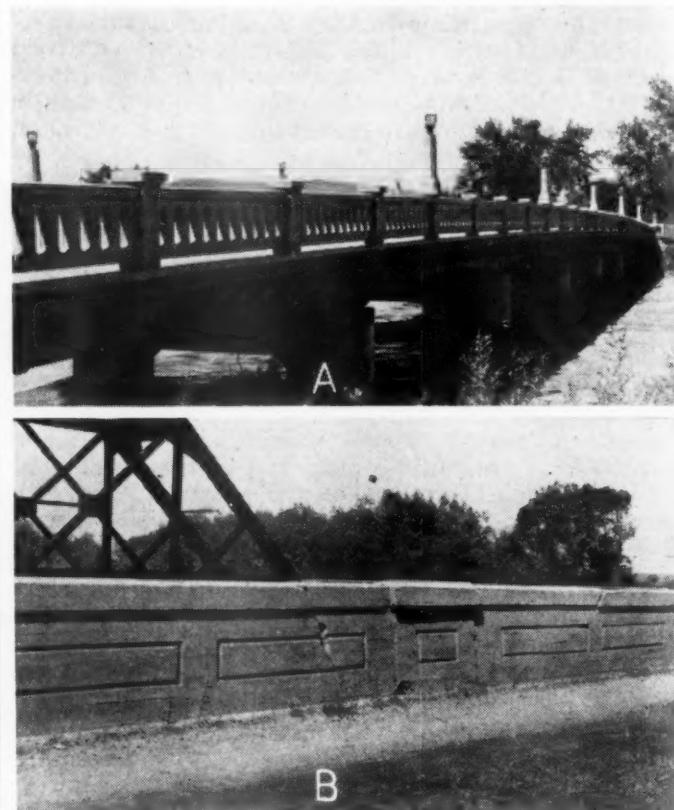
(A) OLD CONCRETE BRIDGE IN WYOMING IN GOOD CONDITION AFTER 22 YEARS. THE BRIDGE WAS BUILT IN 1921. (B) AN EXAMPLE OF TYPE 1 DETERIORATION IS A BRIDGE IN WYOMING BUILT IN 1921. THE CONCRETE IS IN GOOD CONDITION EXCEPT FOR CRACKS DUE TO IMPACT FROM COLLIDING VEHICLES.
